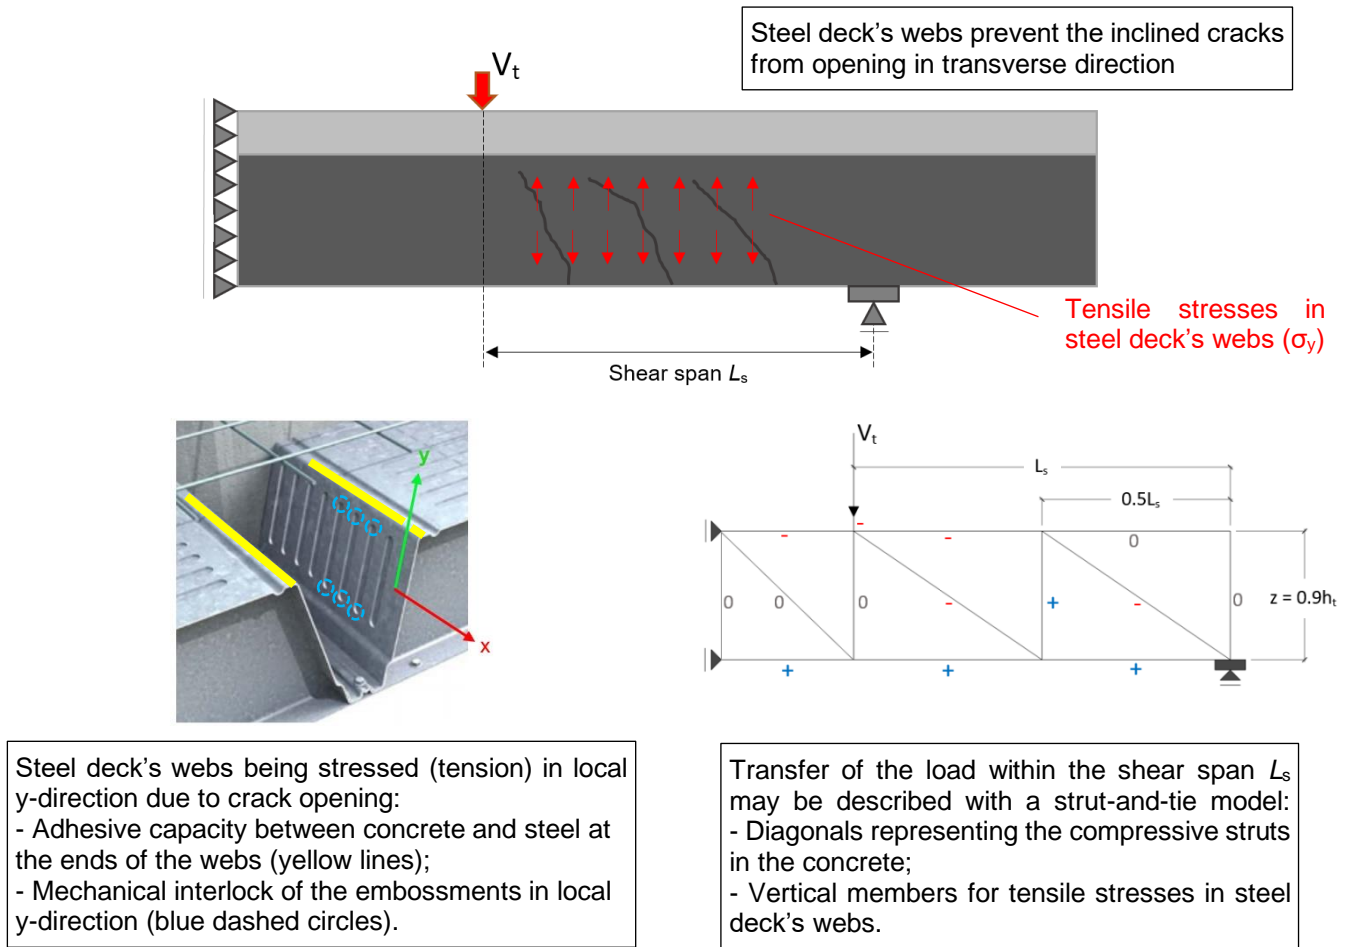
Stirrup-functioning of steel deck's webs in deep composite slabs
